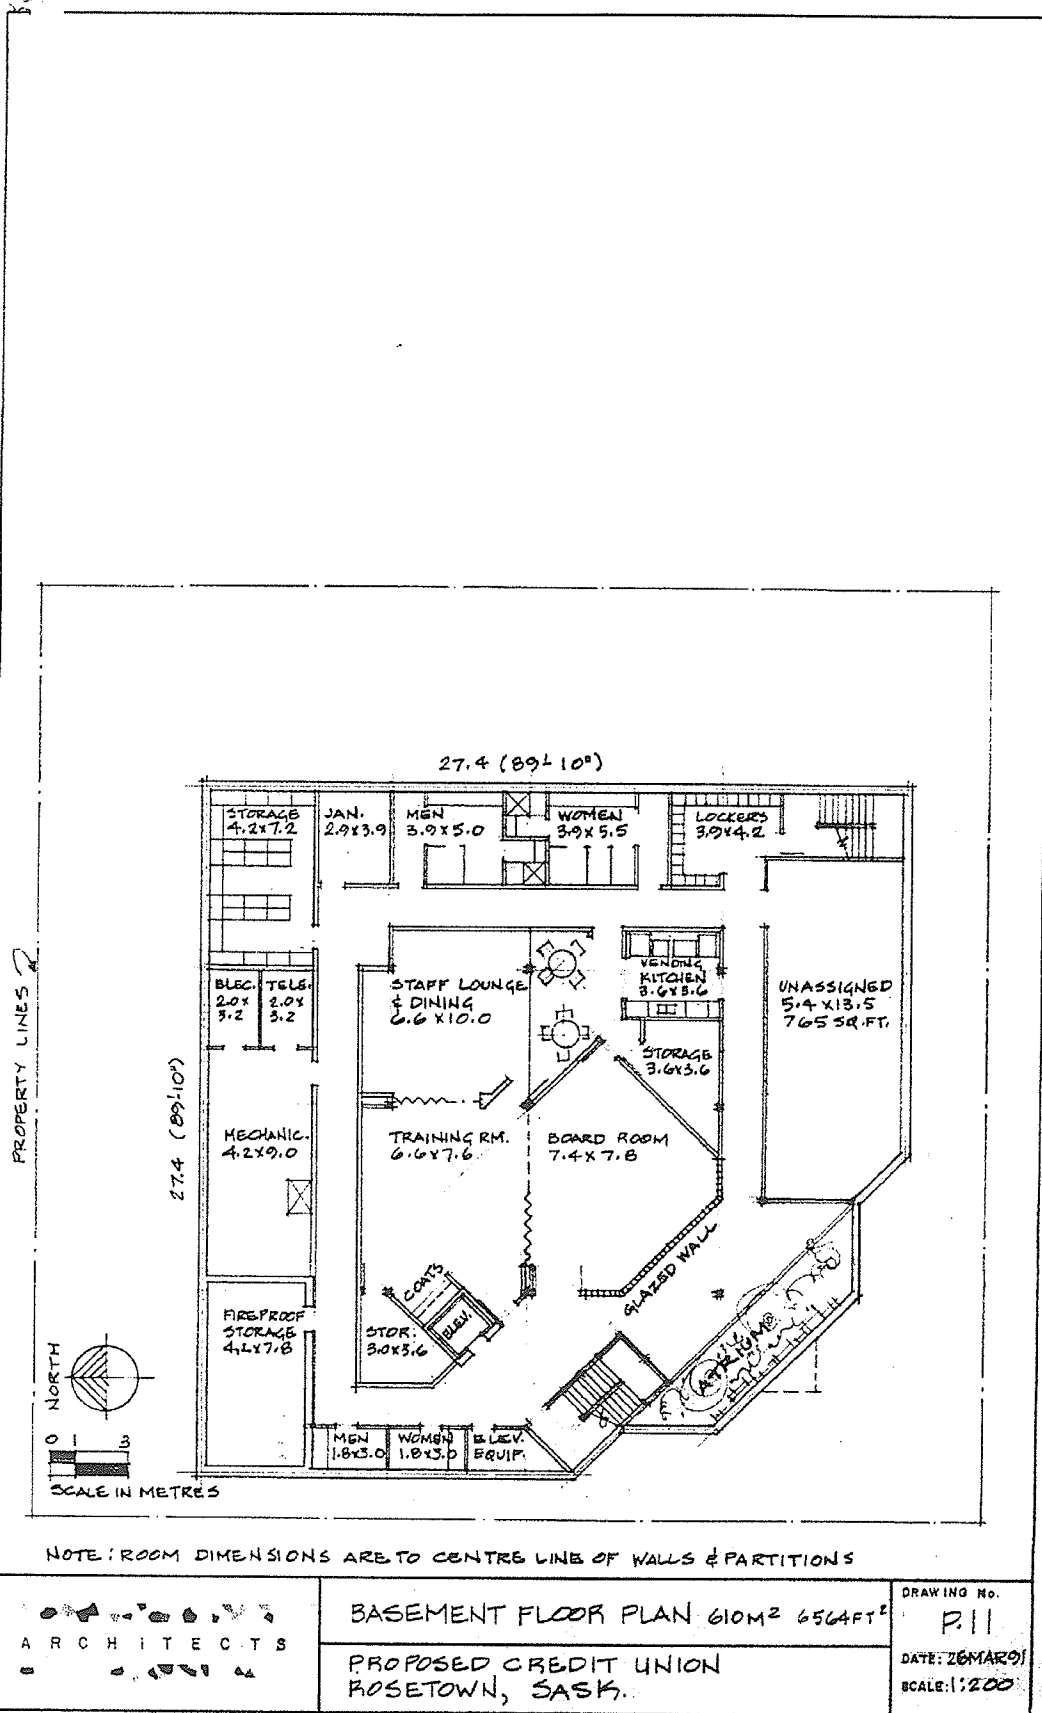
Architect design sketch 11, Basement Floor Plan. Courtesy of the architect.
